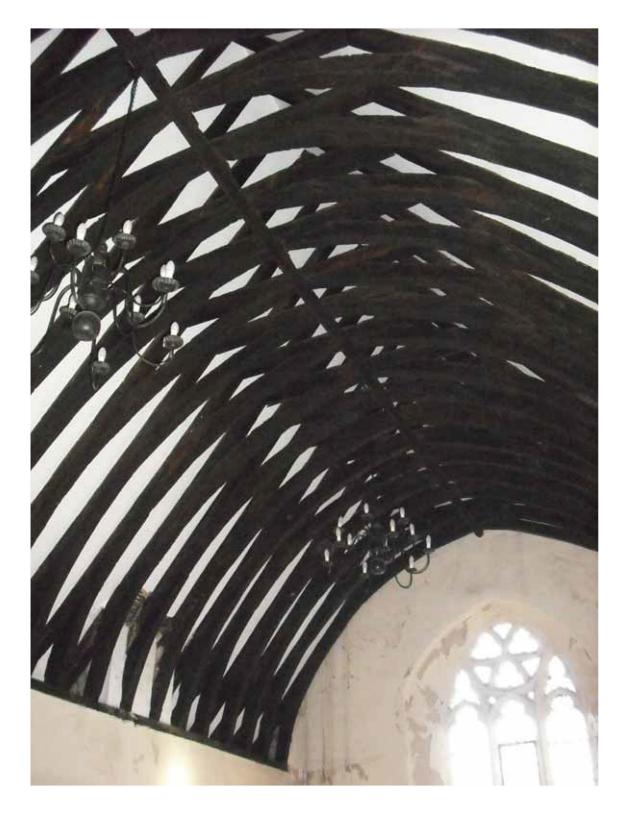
View of the wagon roof to St Anne's Chapel, Barnstaple, looking east. Photograph Martin Bridge
